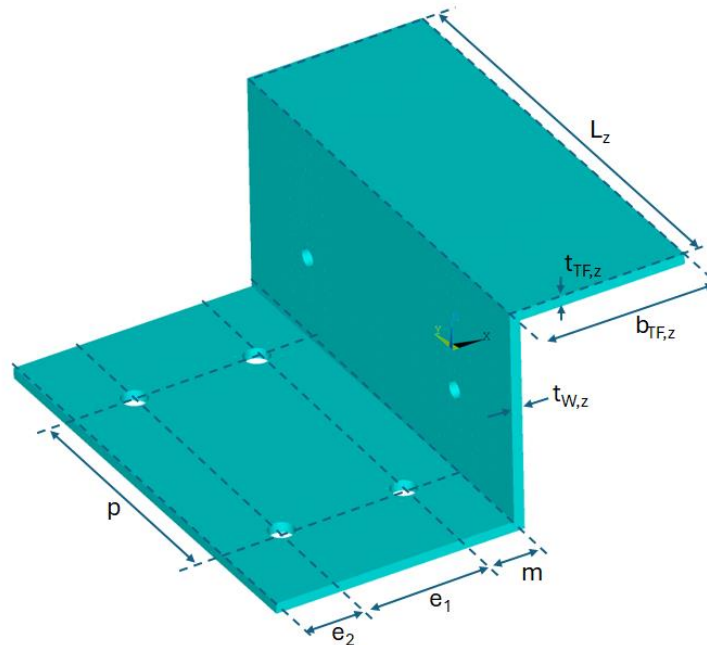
Definition of geometrical dimensions for the Z-shaped steel profile
